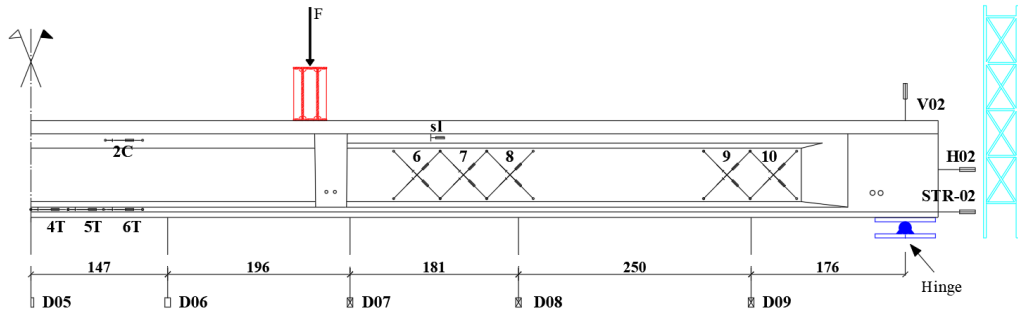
Test setup and layout of the monitoring system installed on B7-P47/46 girder (unit: cm).
